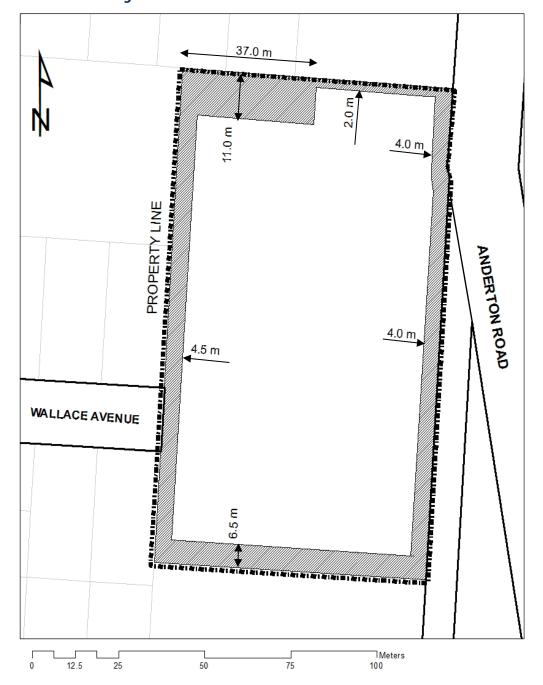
Lot 2 Plan 43630 - All Other Setbacks
